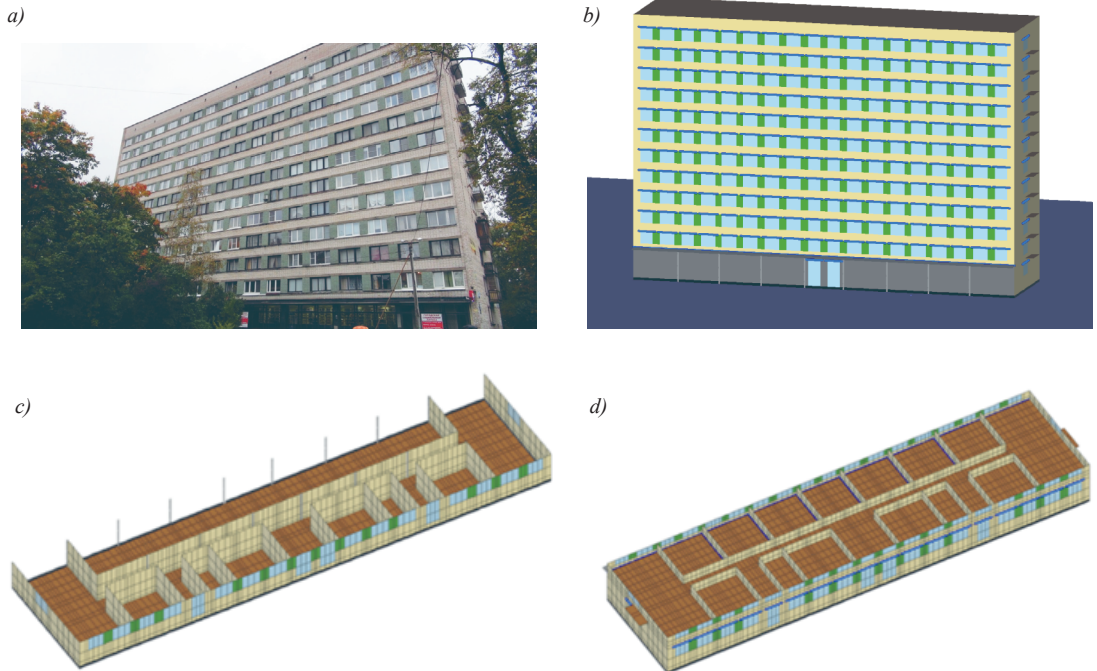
Extended brick building of the standard series u-5733 ; a) – photograph of the building; b) – the settlement model; c) – the ground floor plan; d) – a standard floor plan.
